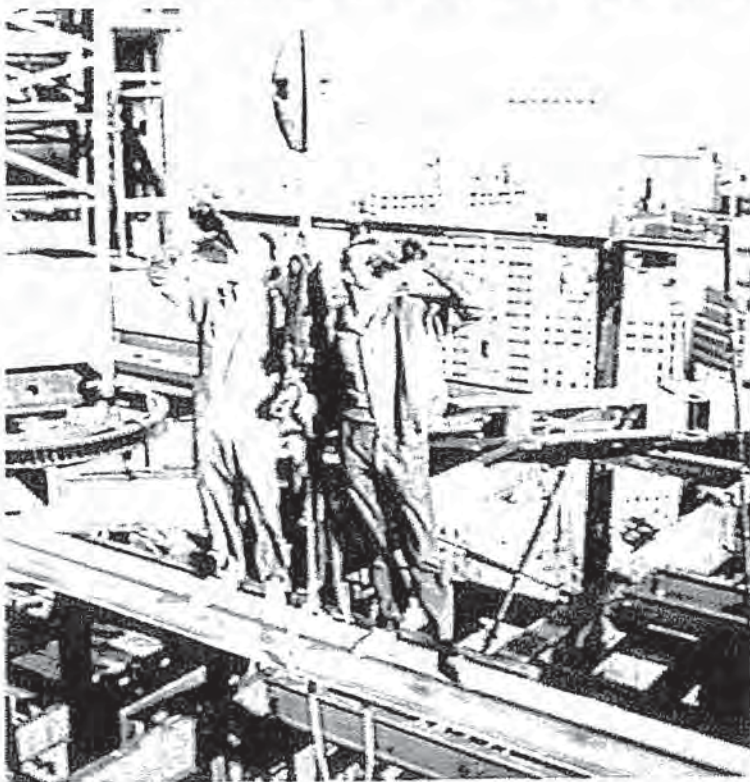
Images of the riggers and dogmen on the Gold Fields Site drinking beer. They are celebrating the last girder being mounted on the framework. (Source: City of Sydney Archives)
